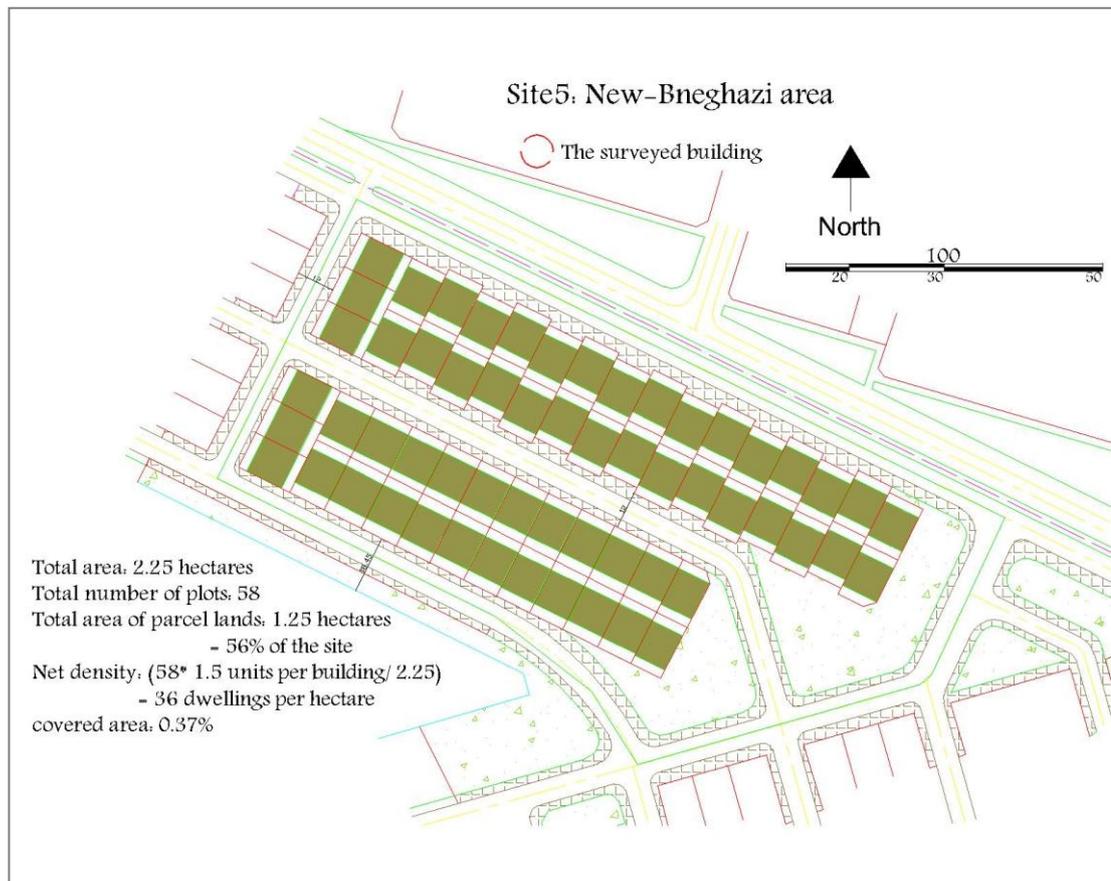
17: Layout Plan, Site Five - New-Benghazi Area
